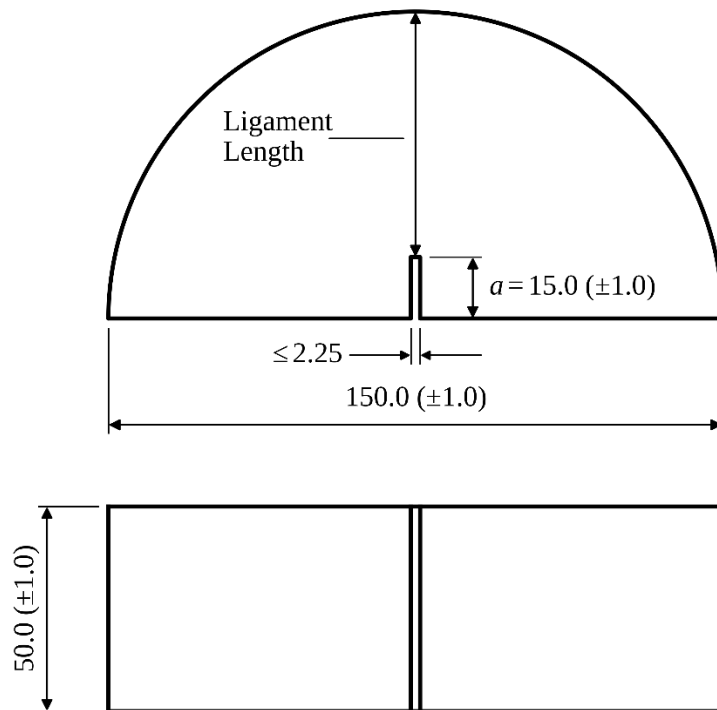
SGC Laboratory Compacted Specimen Configuration (dimensions in millimeters)
